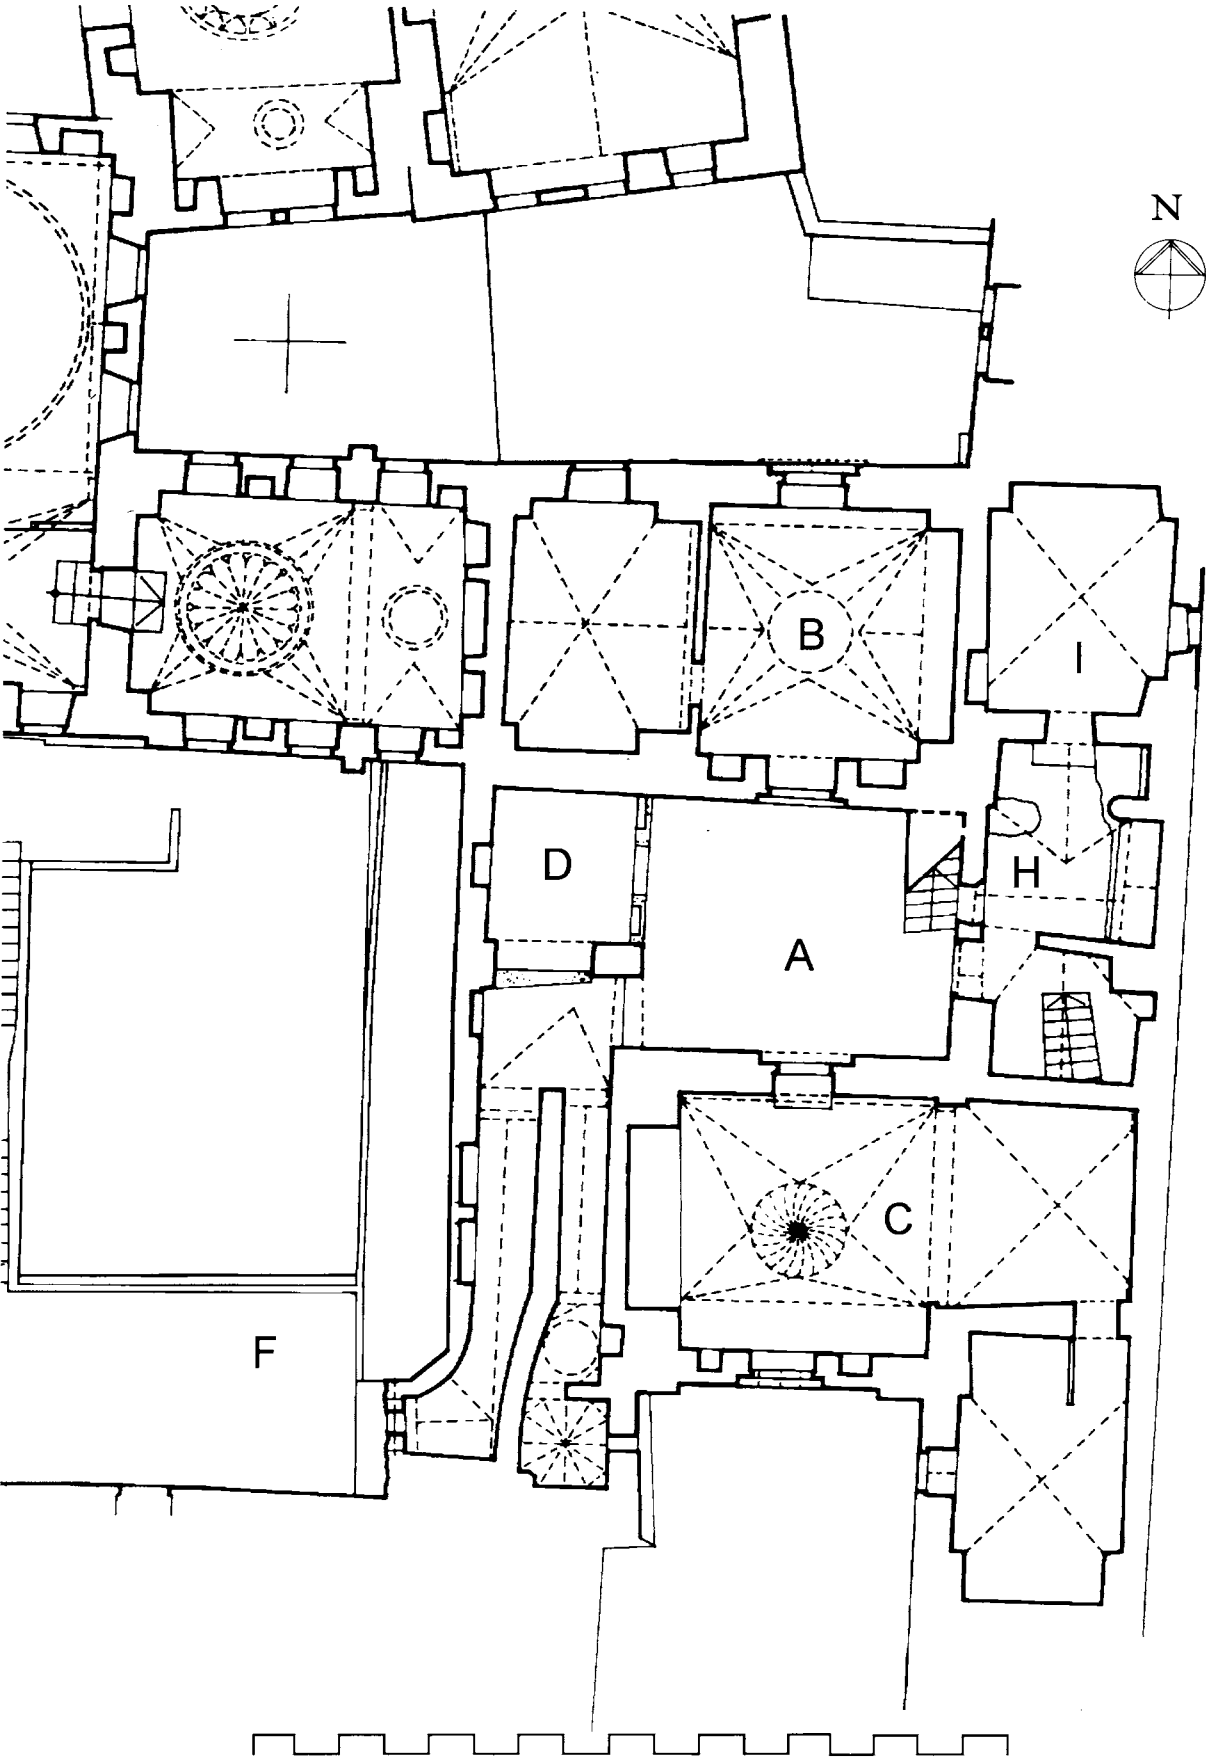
Dar Bairam Jawish, plan of first-floor level.
